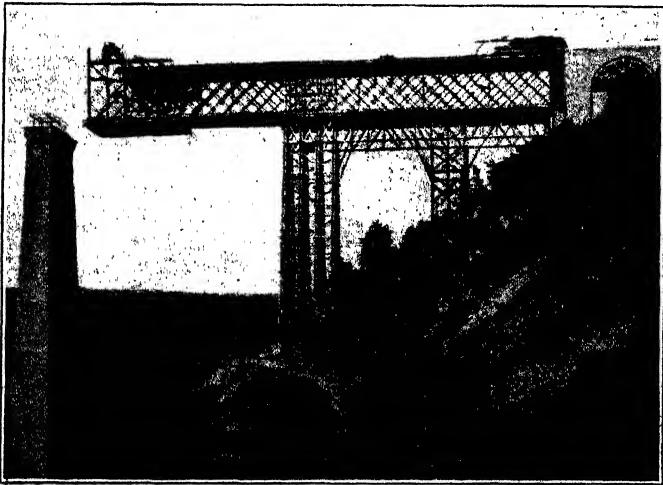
Erection of tall viaduct girder on Paris-Orleans Railway, showing tall masonry pier and temporary trestle piers for erection.
